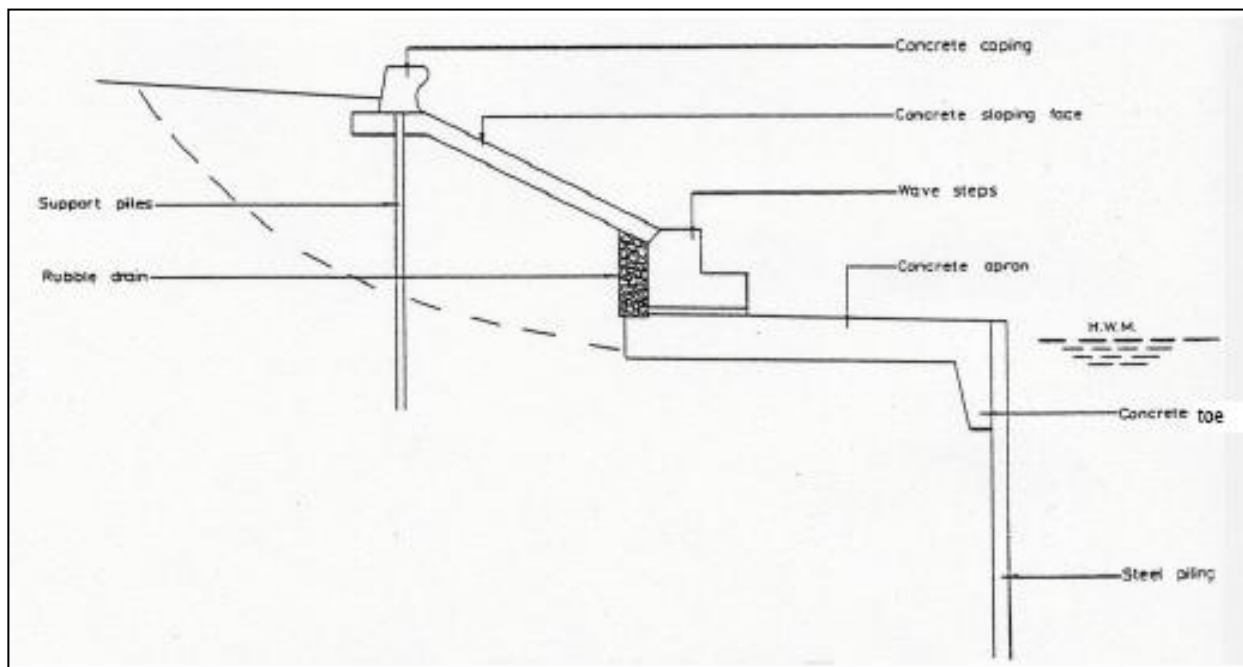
Sloping seawall design, such as that built at Bacton and Walcott around 1954. From Withers (2001).
